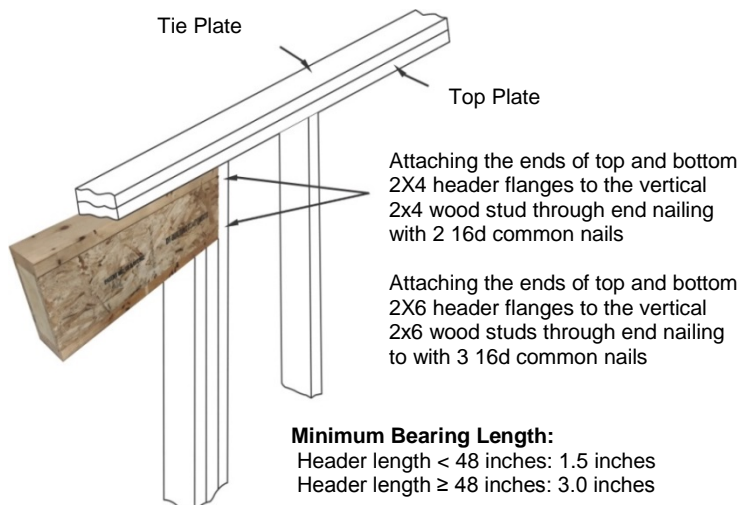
DT HEADERS AND TYPICAL INSTALLATION
